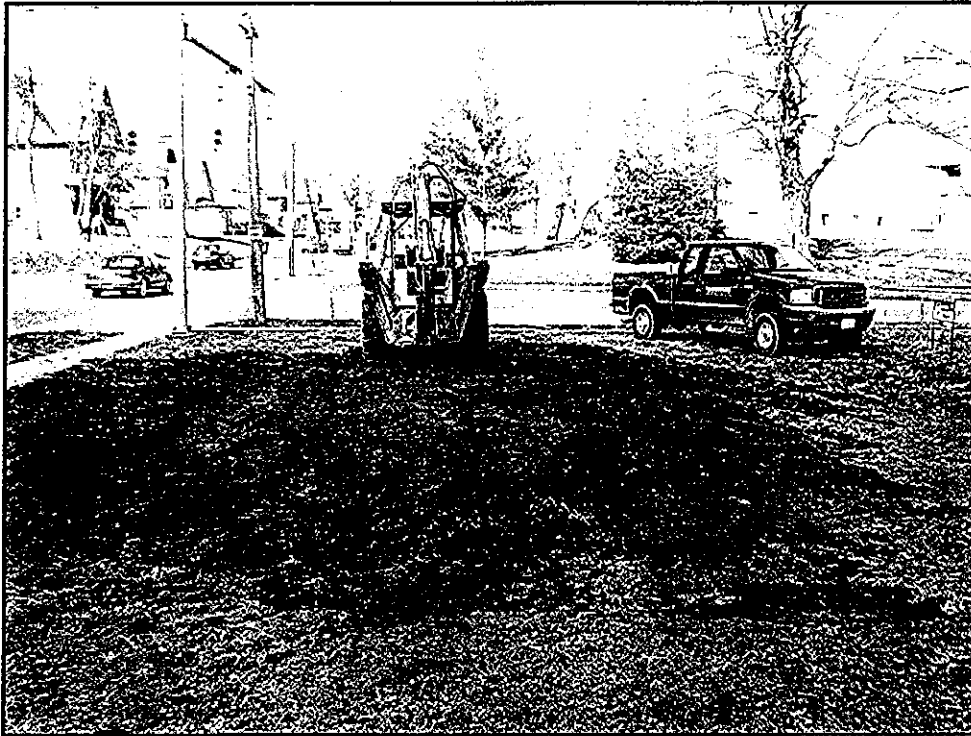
VIEW TOWARD THE NORTH OF AREA AT COMPLETION OF EXCAVATION.
